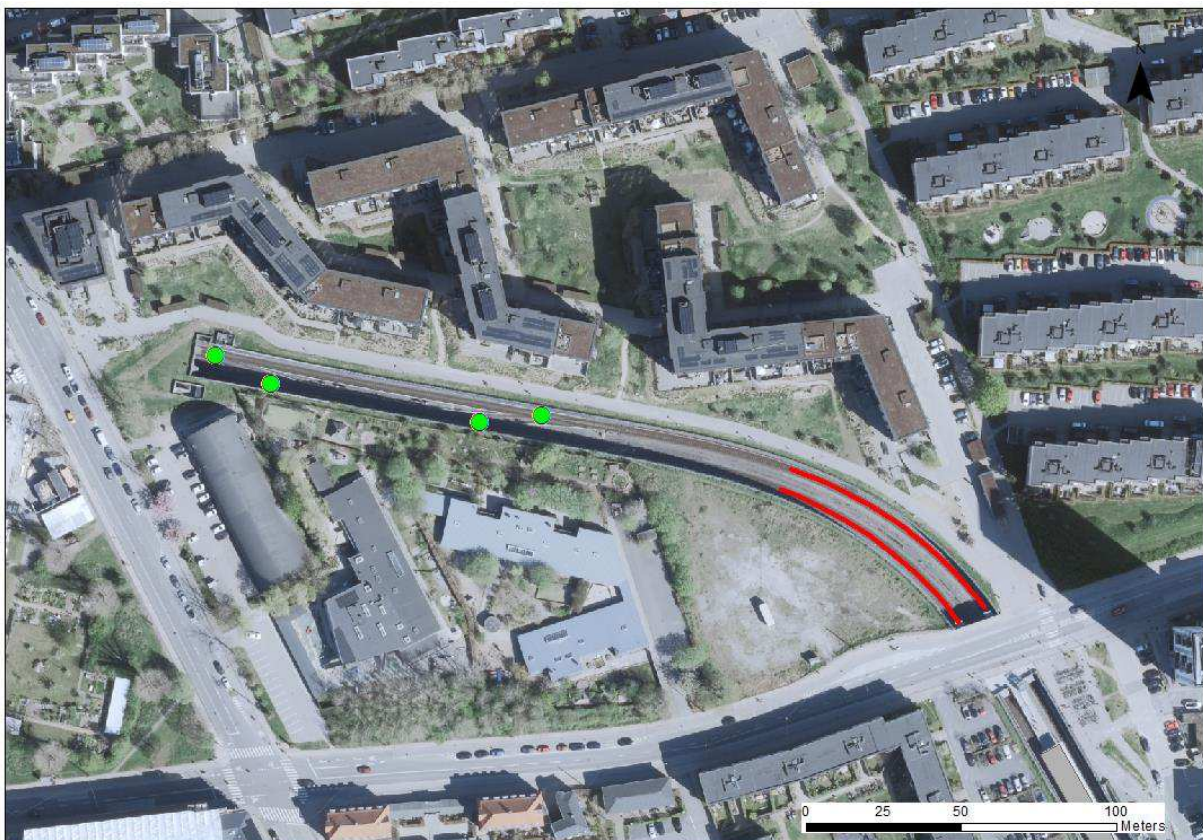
Site plan of the railway trough and surrounding area at Strandlodsvej. Turnouts are marked in green
